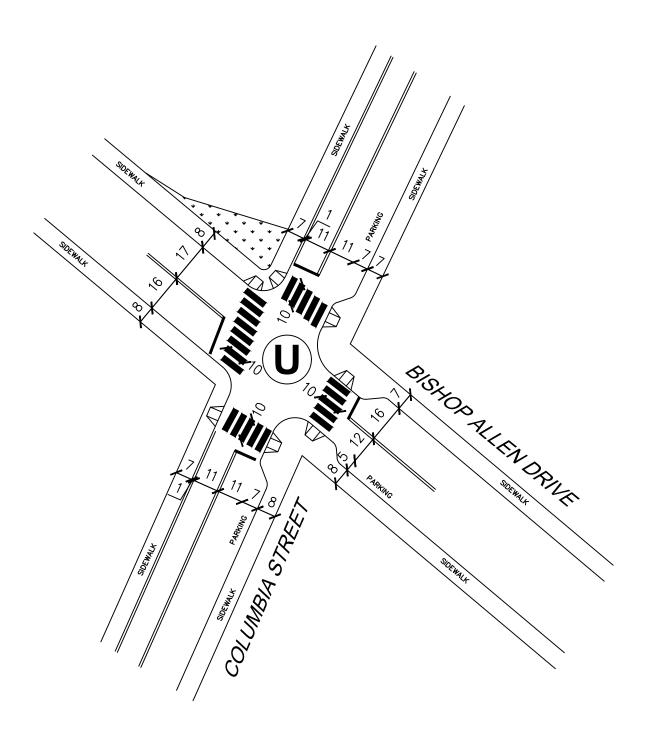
b.2 Existing Conditions Intersection Sketch Bishop Allen Drive at Columbia Street
